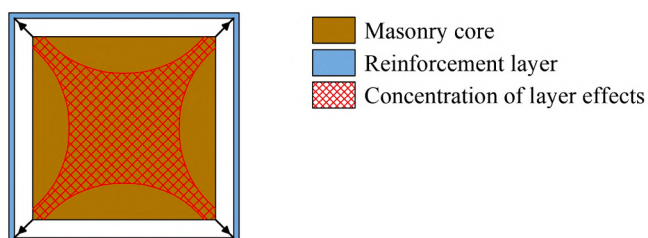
Concentration of layer effects in the cross-section of the structural element due to the application of an external reinforcement layer with a Poisson's coefficient higher than that of masonry.
